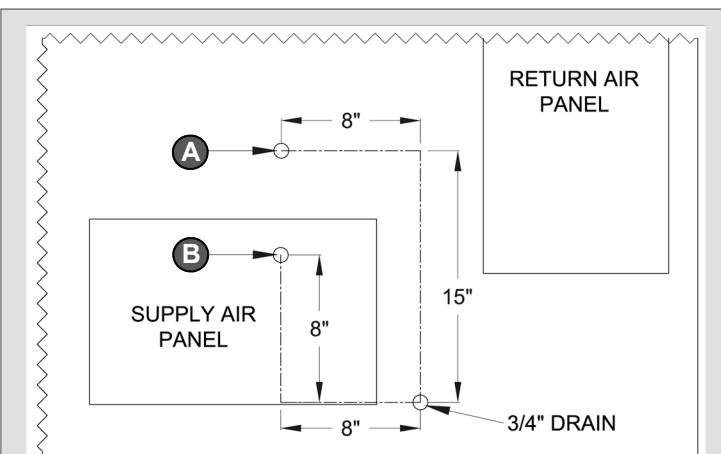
EXAMPLE, LEFT DRAINING INSTALLATION
